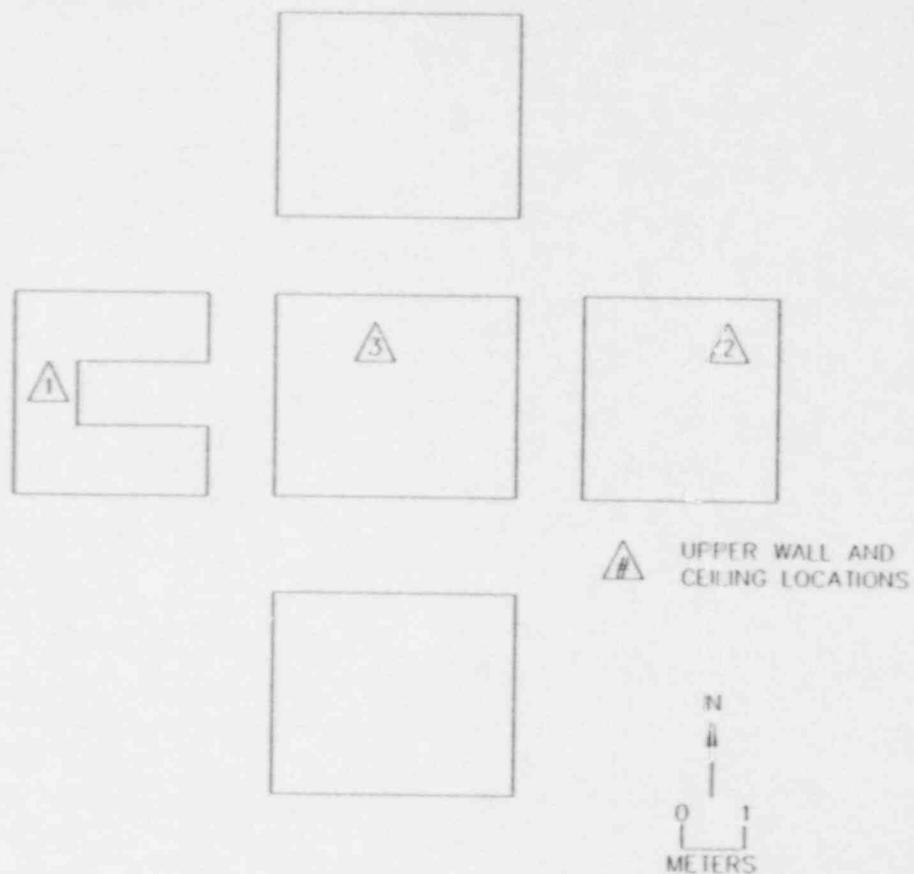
Room 22 Showing Locations of Upper Wall and Ceilings Single-point Measurements
